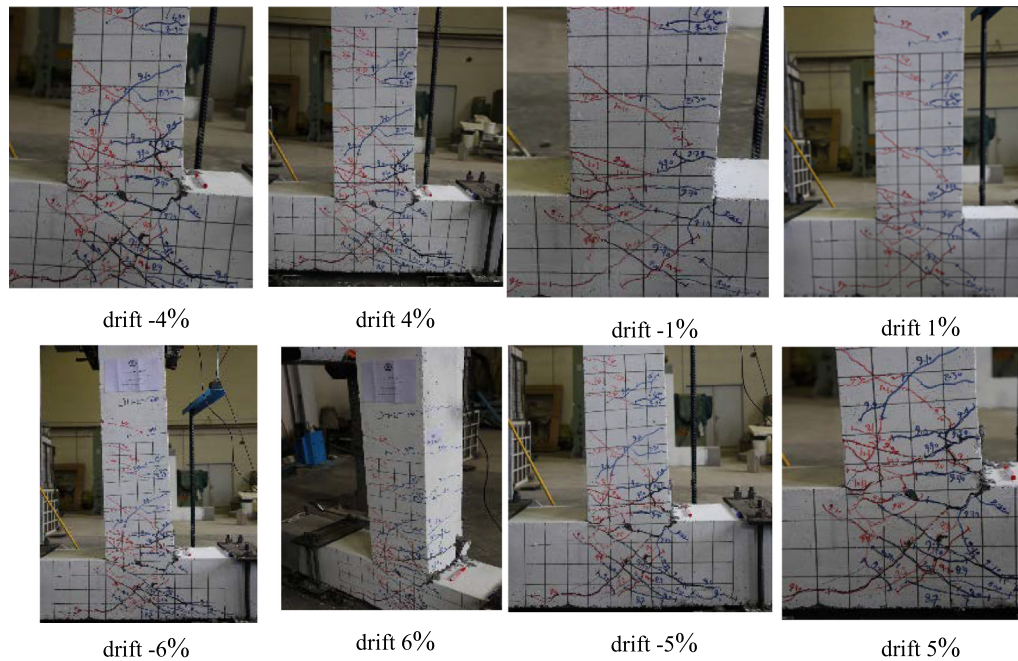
Crack propagation under loading in the specimen JH2-SCC.
